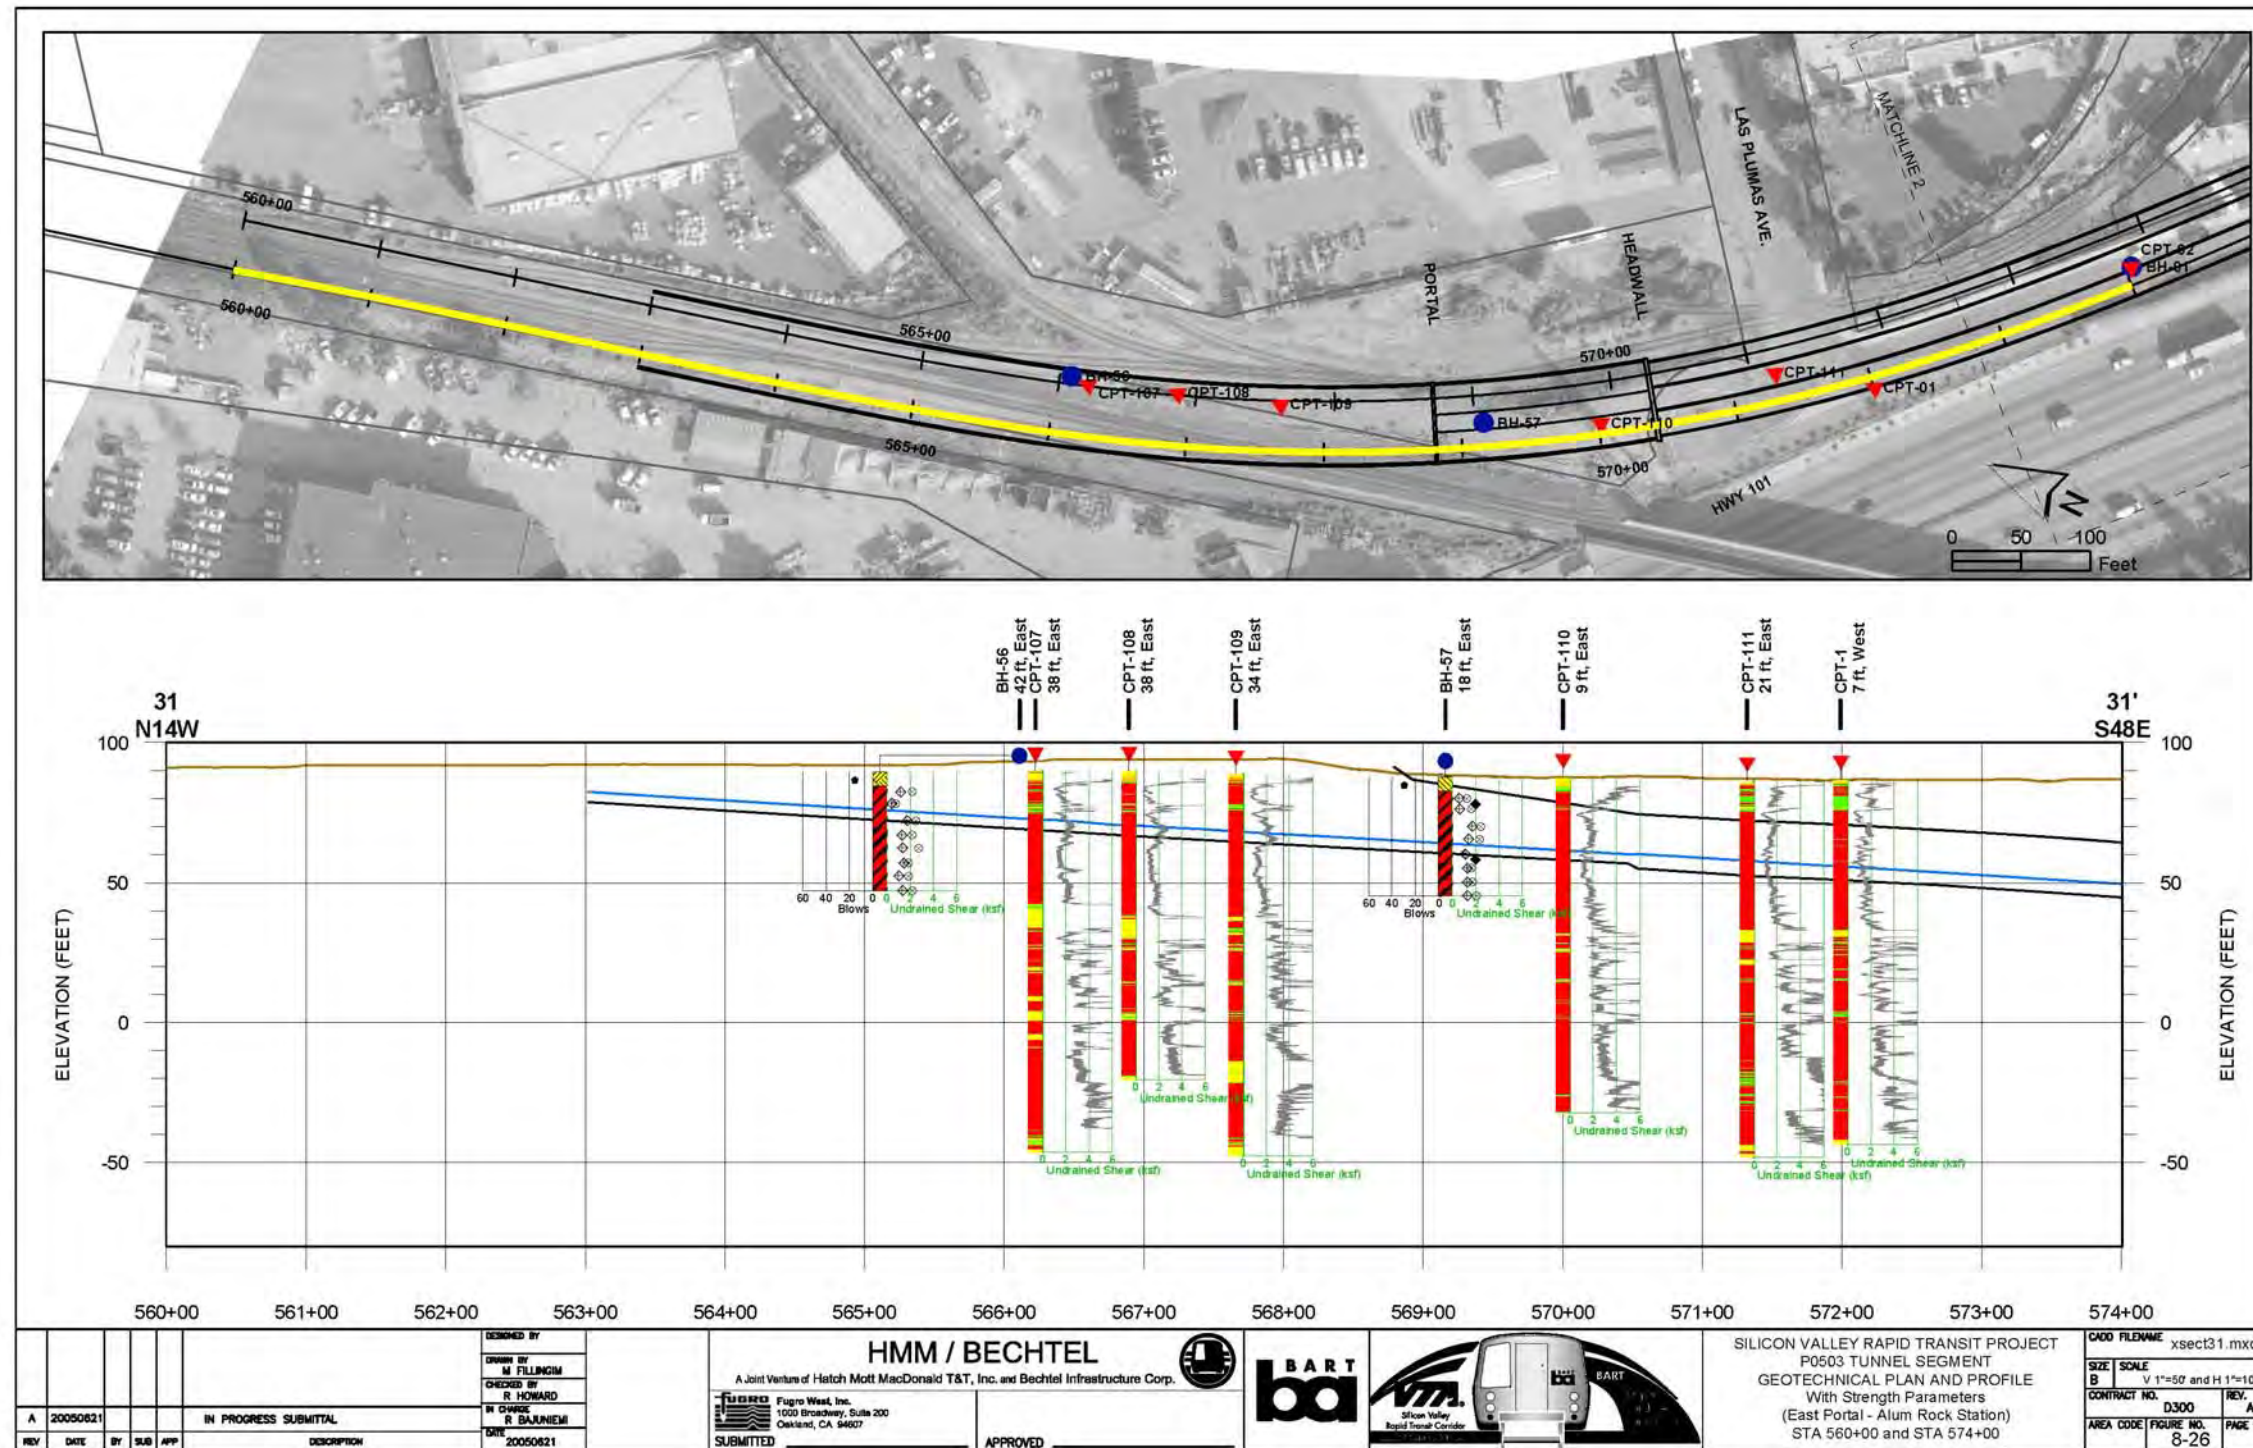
Geotechnical Plan and Profile with Strength Parameters: 560+00 to 574+00.
